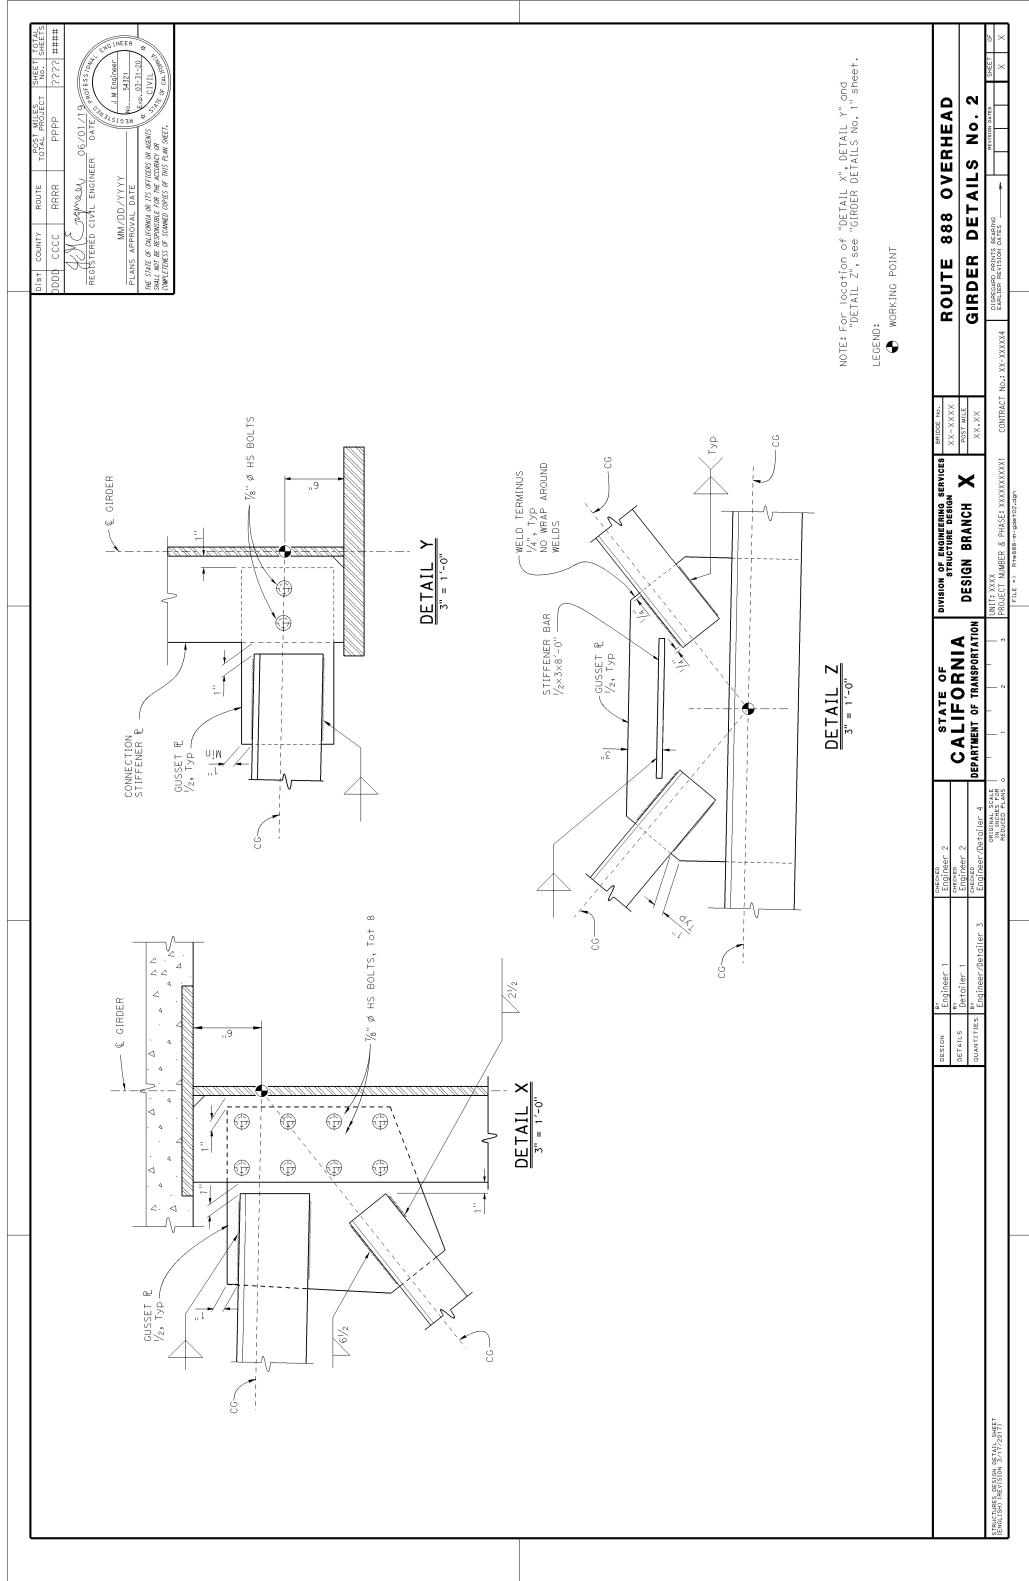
A.A.12 Steel Girder Bridge Detailing Example 12
